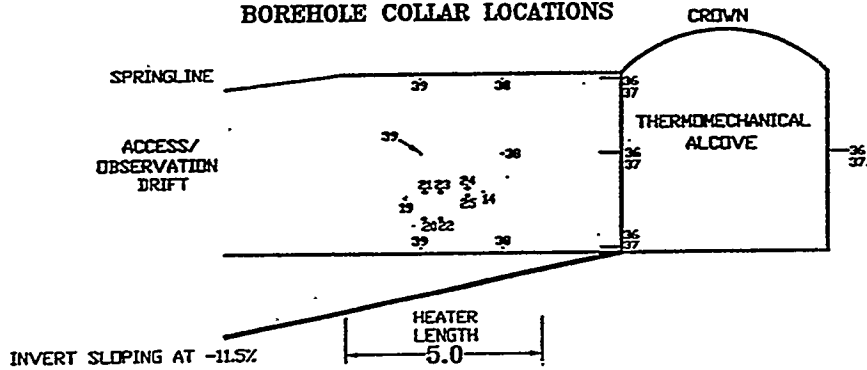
Layout and borehole arrangement in the Single Heater Test.
